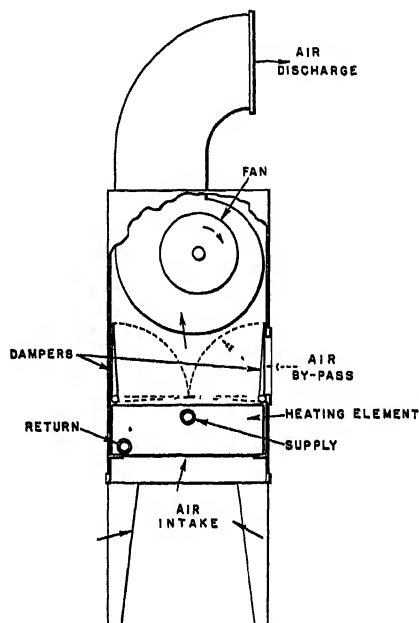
FLOOR MOUNTED UNIT HEATER, HOUSED TYPE FAN
